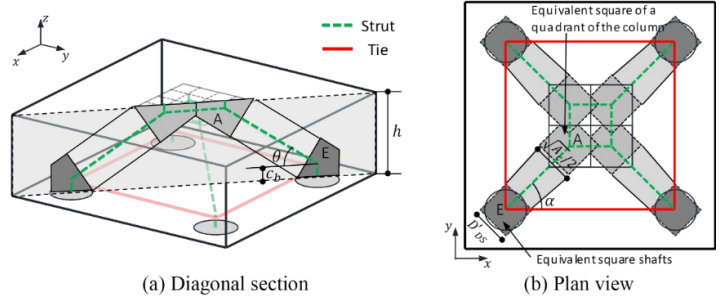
Detail of 3D nodal geometry in drilled shaft footing
